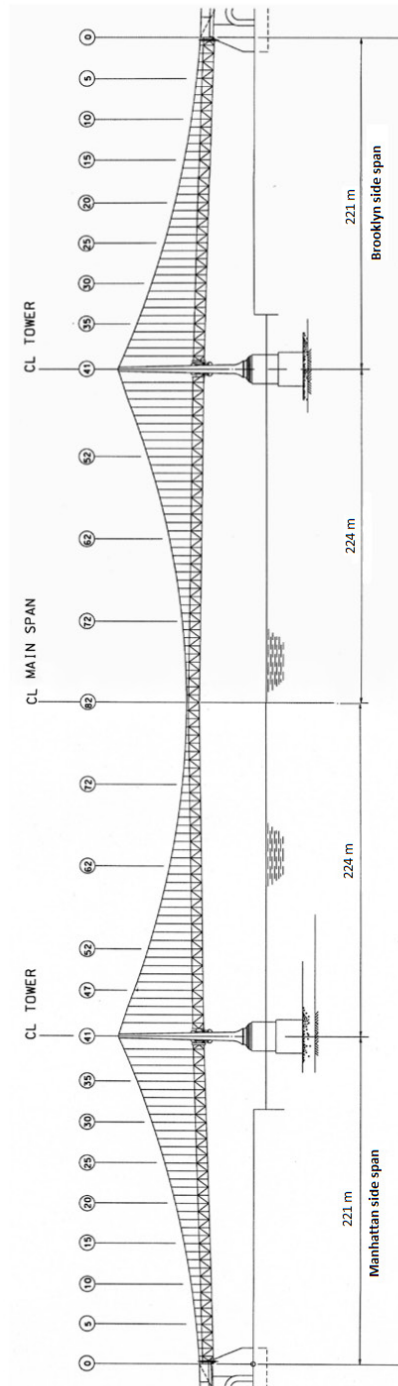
Longitudinal section of the Manhattan Bridge.
